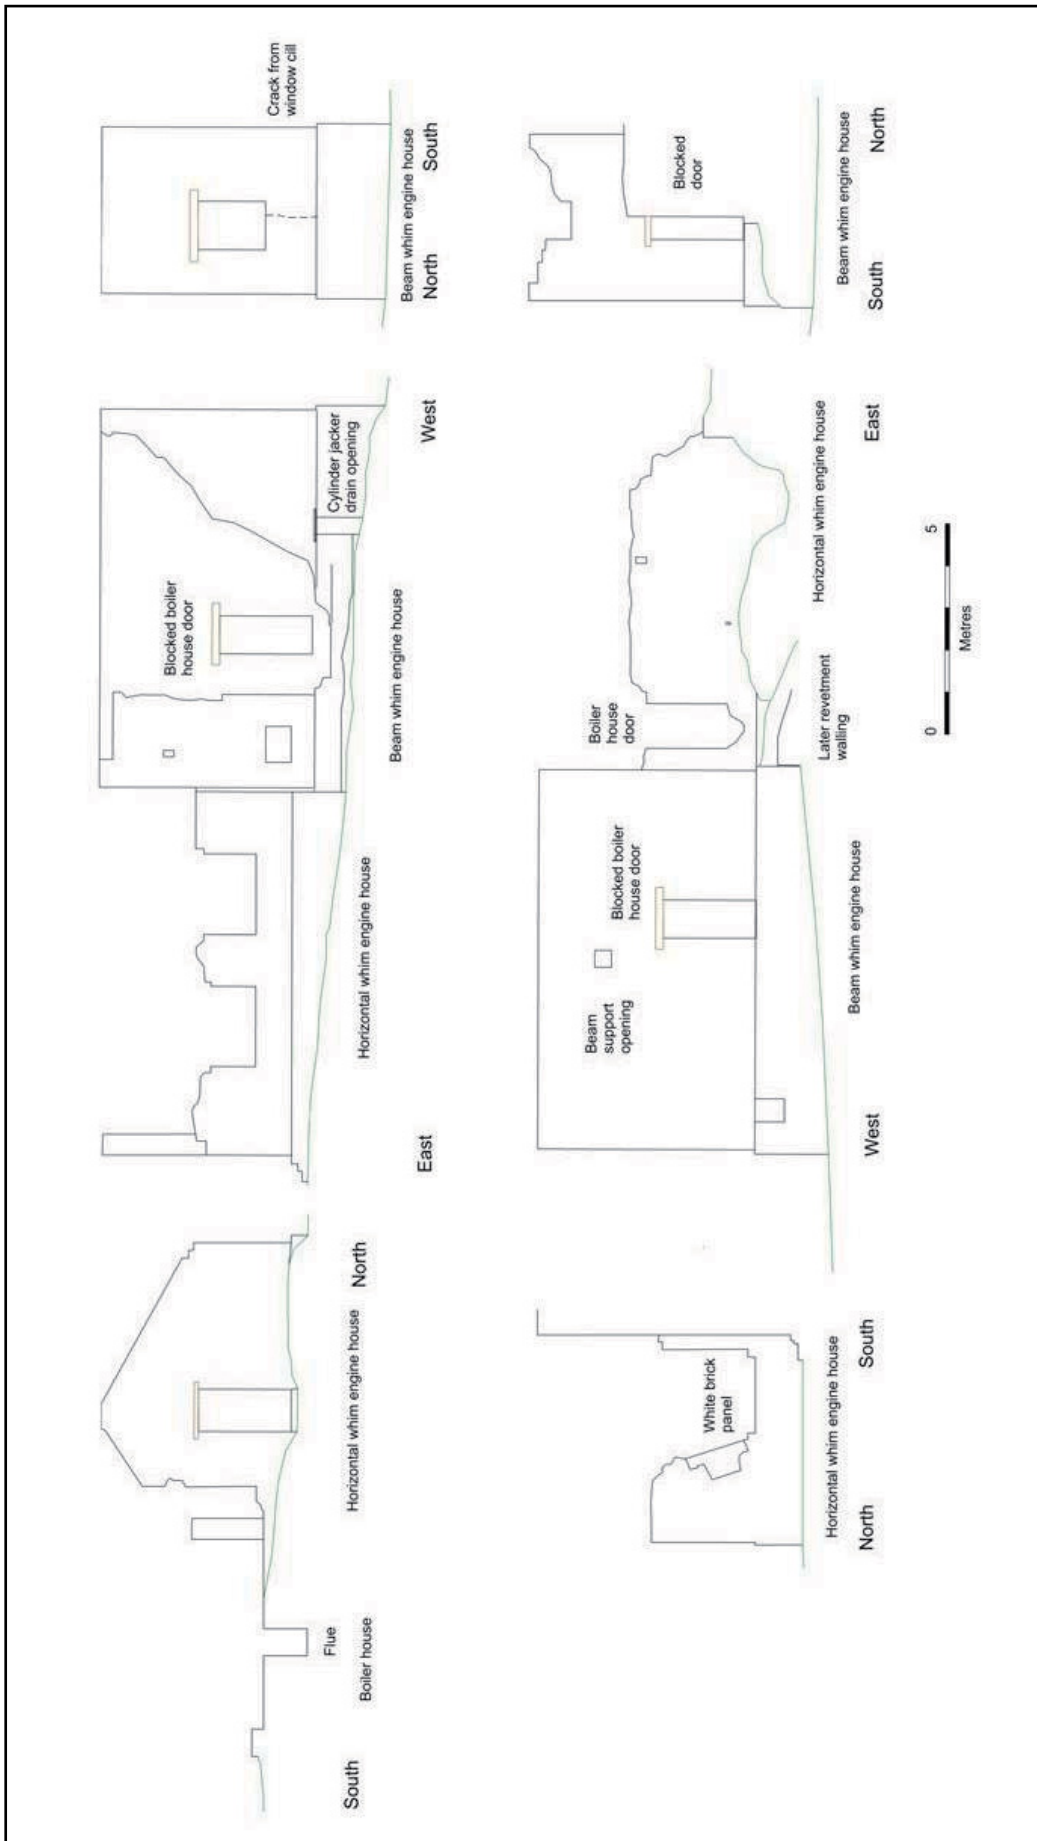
External elevations of horizontal whim engine house [190376] and all-indoor beam whim engine house [190378] at Wheal Coates.
